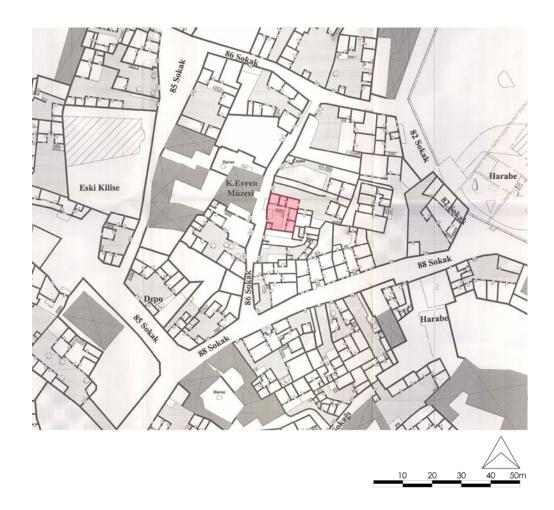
The site plan of Kestaneciler House. (Source: Saf, 2004)
